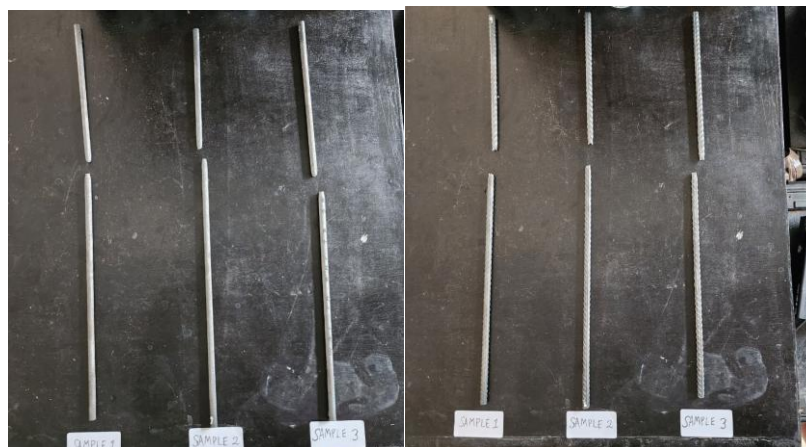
Specimen Condition After Tensile Test: Plain Reinforced Concrete (Left) and Deformed Reinforced Concrete (Right)
